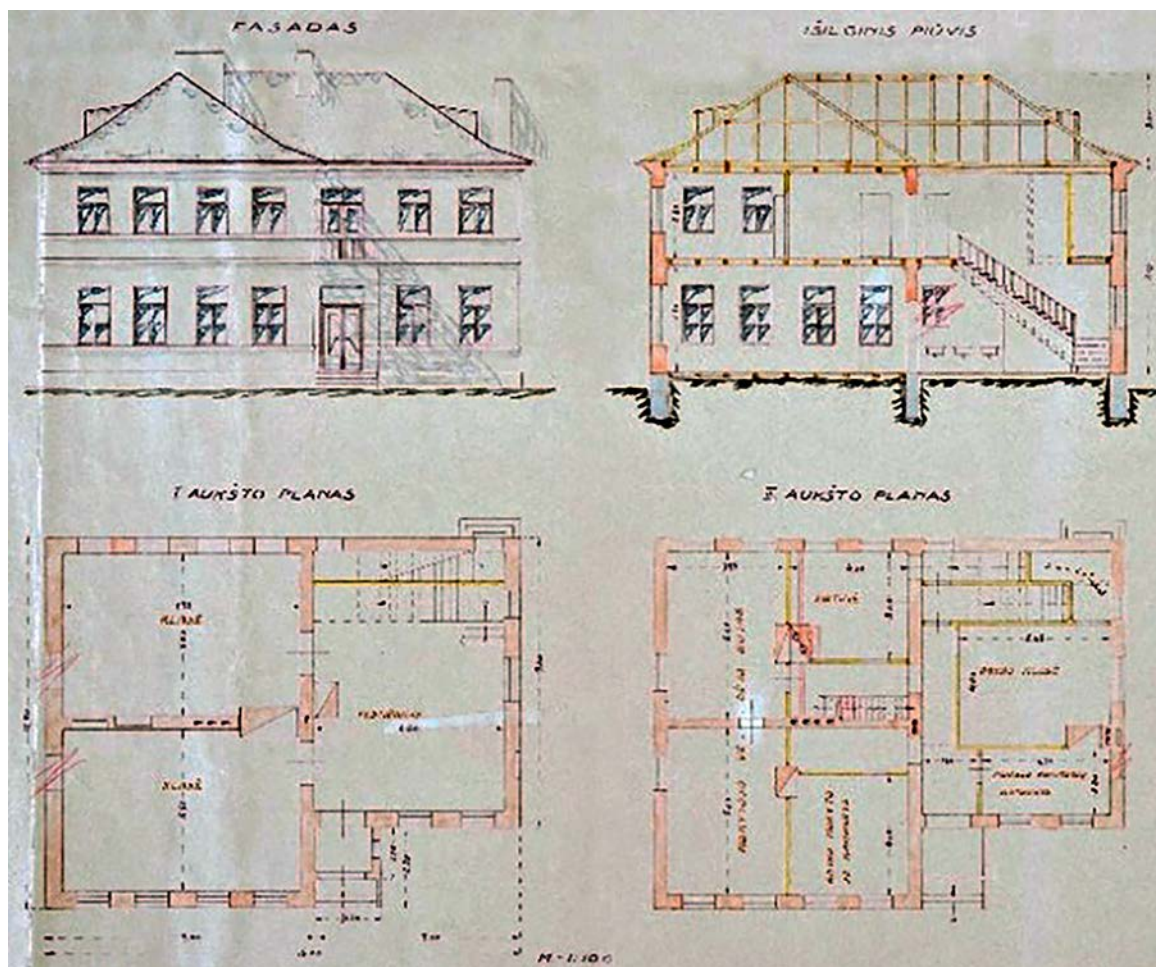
Design project of a standard masonry 2-class primary school building (eng. arch. Algirdas Šalkauskis of the Construction Inspection, 1932) [Drawing from Lithuanian Central State Archives].
